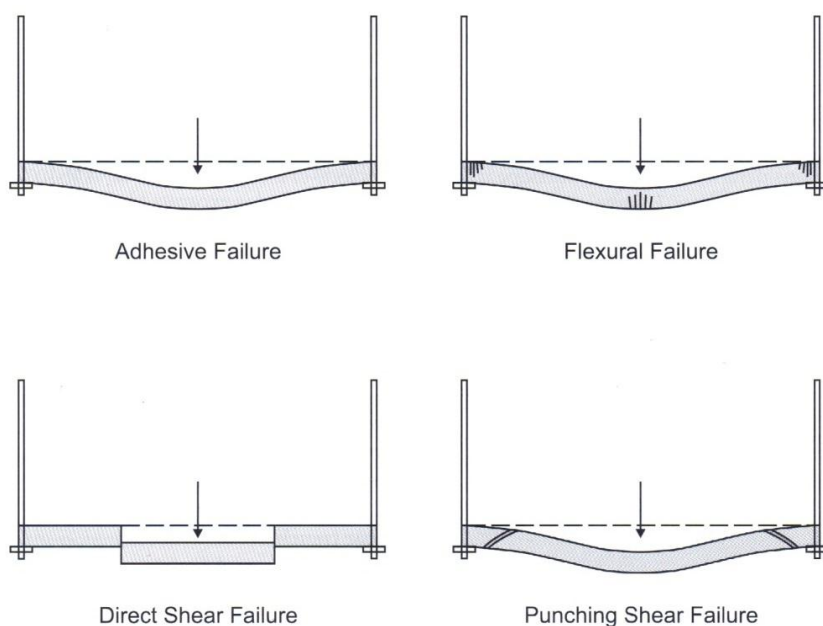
Possible failure modes for shotcrete (Read & Stacey, 2009).
